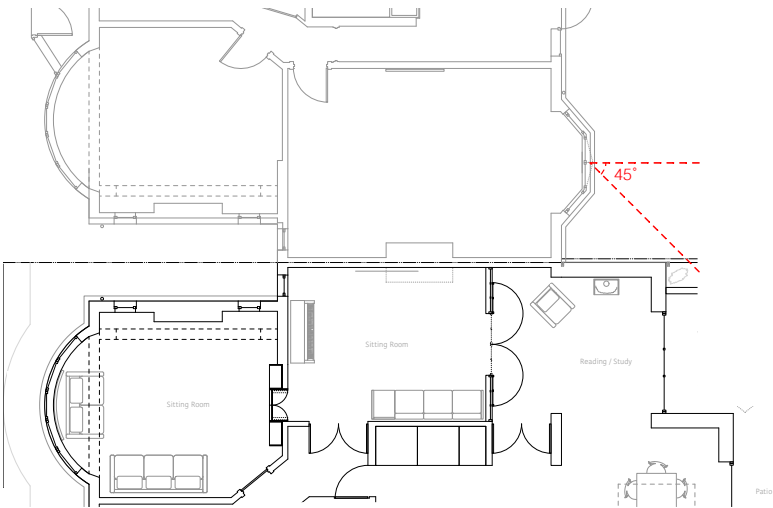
Proposed ground floor plan alongside adjoining neighbours
